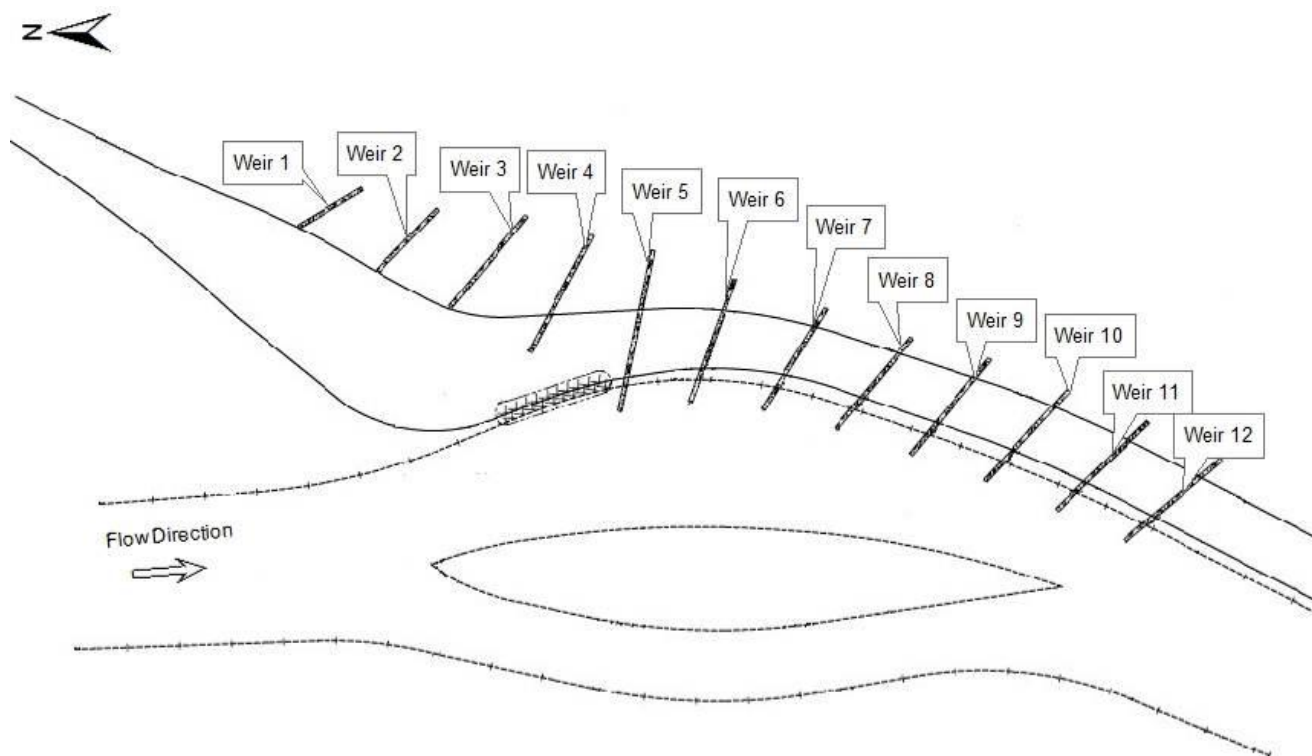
Plan-view sketch of bendway-weir field design (adapted from BIO-WEST (2006))
